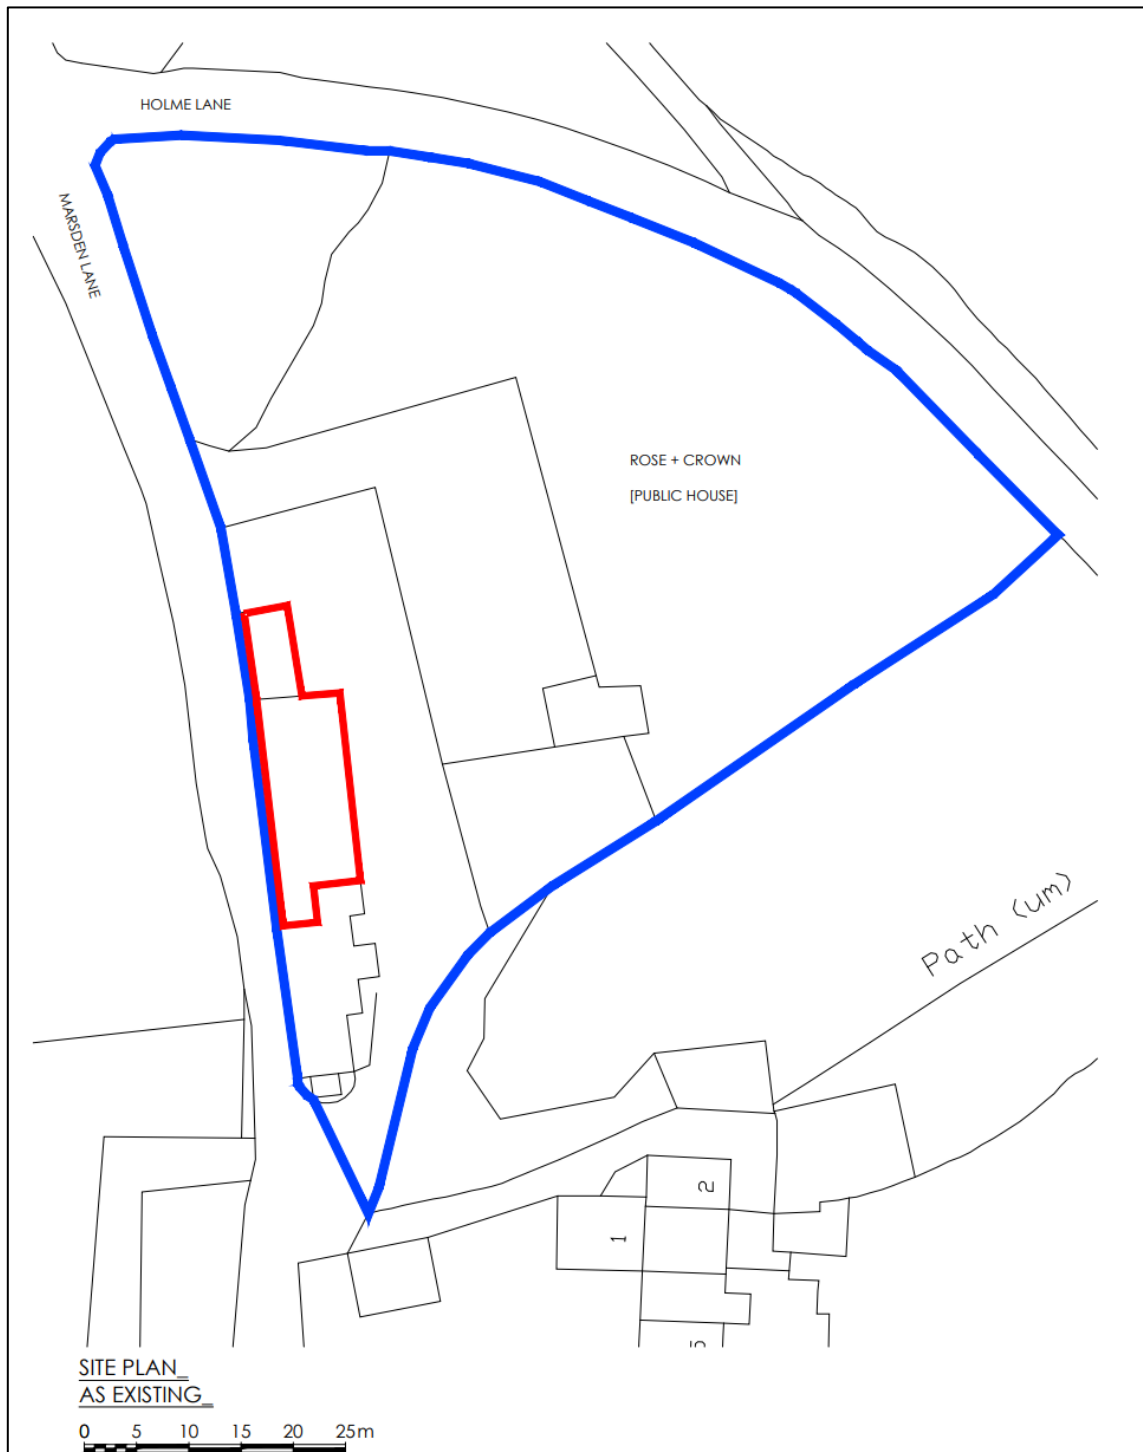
Existing Site Plan © Eight_OneTwo Architects
